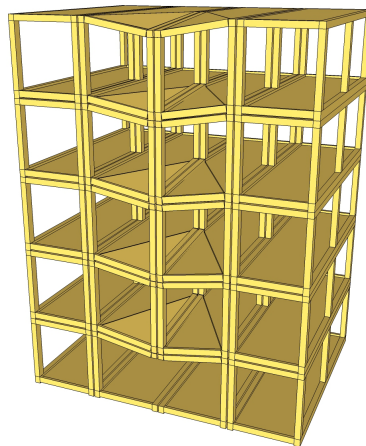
The final deformed state of a modular section, after exterior facade column removal scenario. With the lack of vertical ties in a modular building, each floor carries the same load and has the same failure mode.
